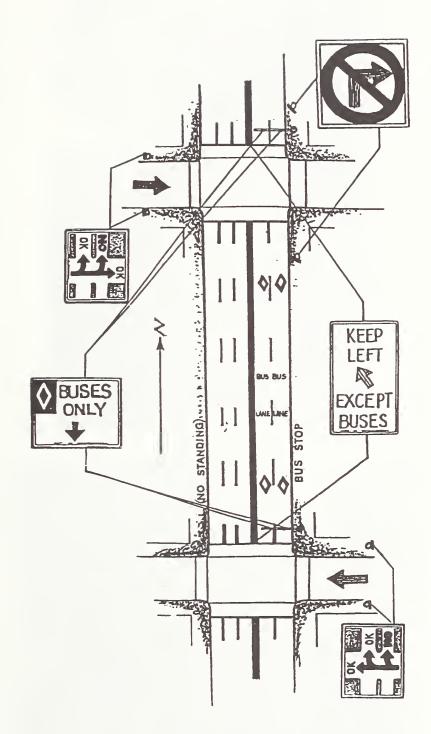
MADISON AVENUE DUAL BUS LANE PLAN
